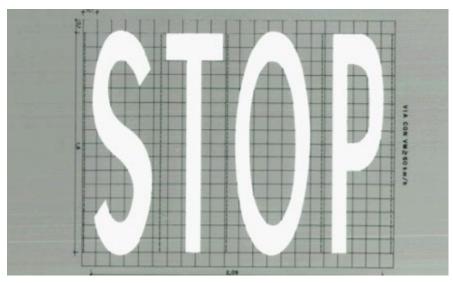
Road Mark M-6.4, Stop horizontal sign.
